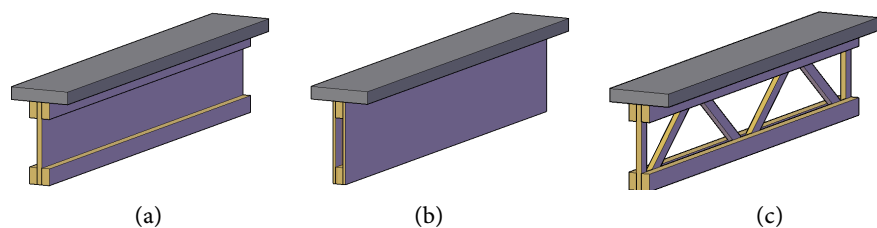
Timber-concrete composite floors: (a) I-shaped joist; (b) box-shaped joist; (c) OWTJ.
